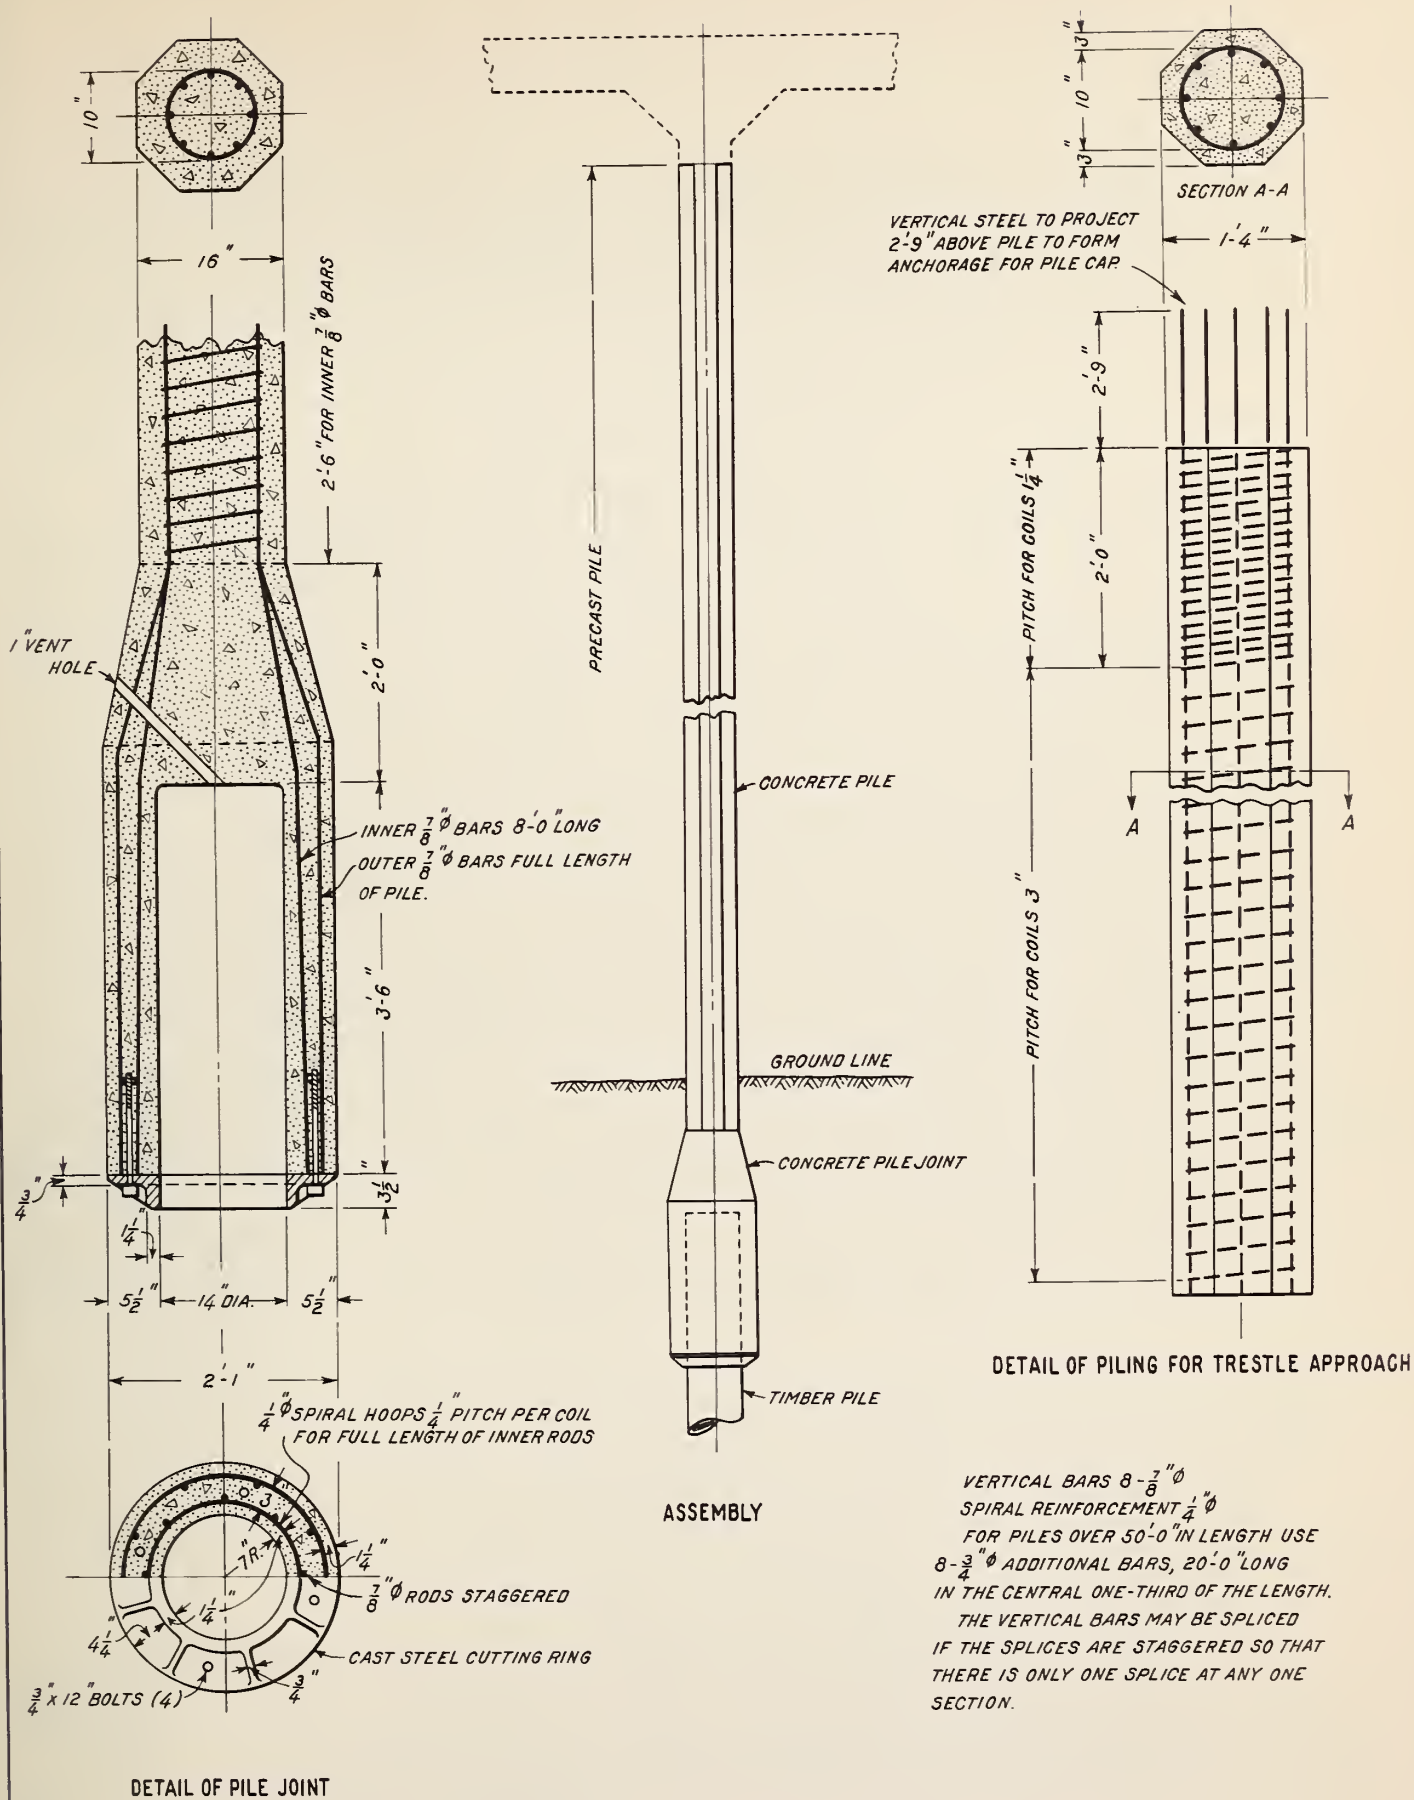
DETAILS OF REINFORCED CONCRETE SECTION OF COMPOSITE PILING.
